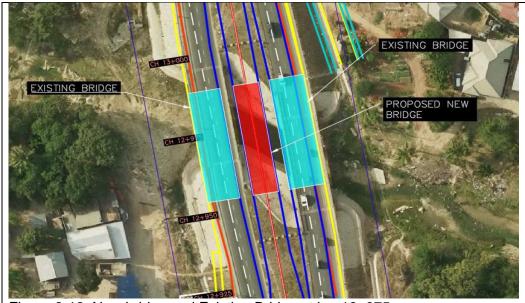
New bridge and Existing Bridge at km 12+975.
